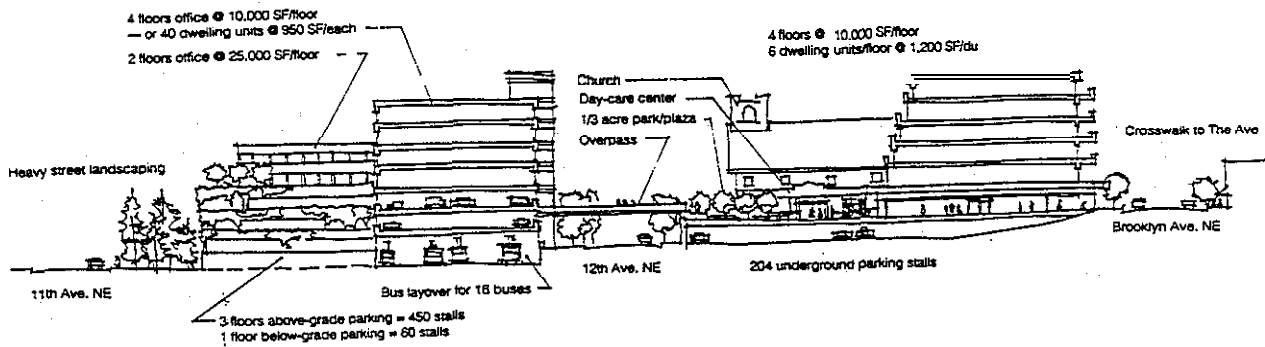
Parking Structure Design Proposed as Part of U W Design Charrette
